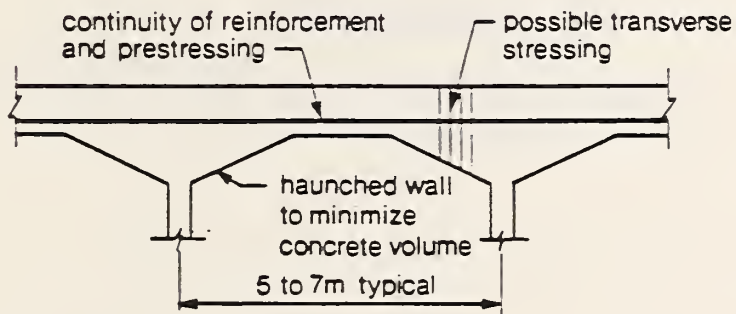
Structural arrangement for concrete ice wall (from Reference 1)
